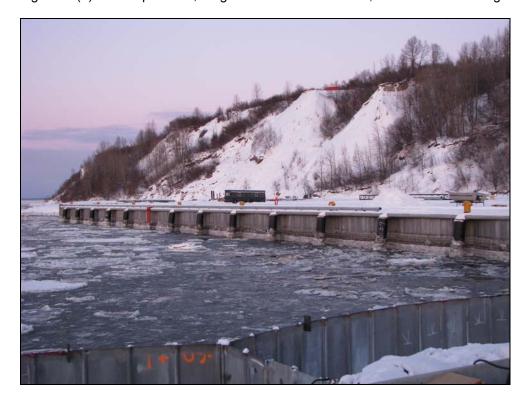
(b). Sheet pile cells, barge berth construction site, high tide. Dec. 11, 2008. View facing north. APU Observation Station on bluff in background.
